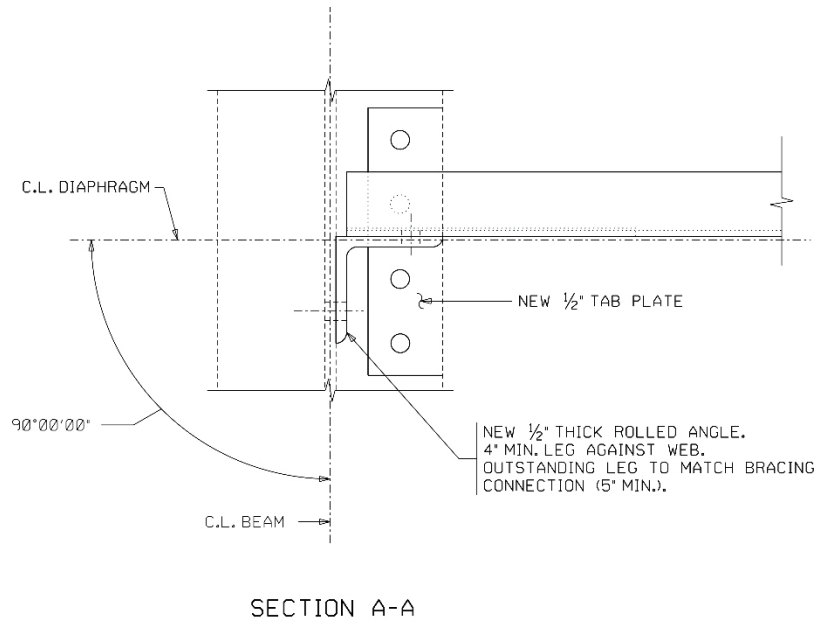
Plan view of new bracing connection (Minnesota DOT)
